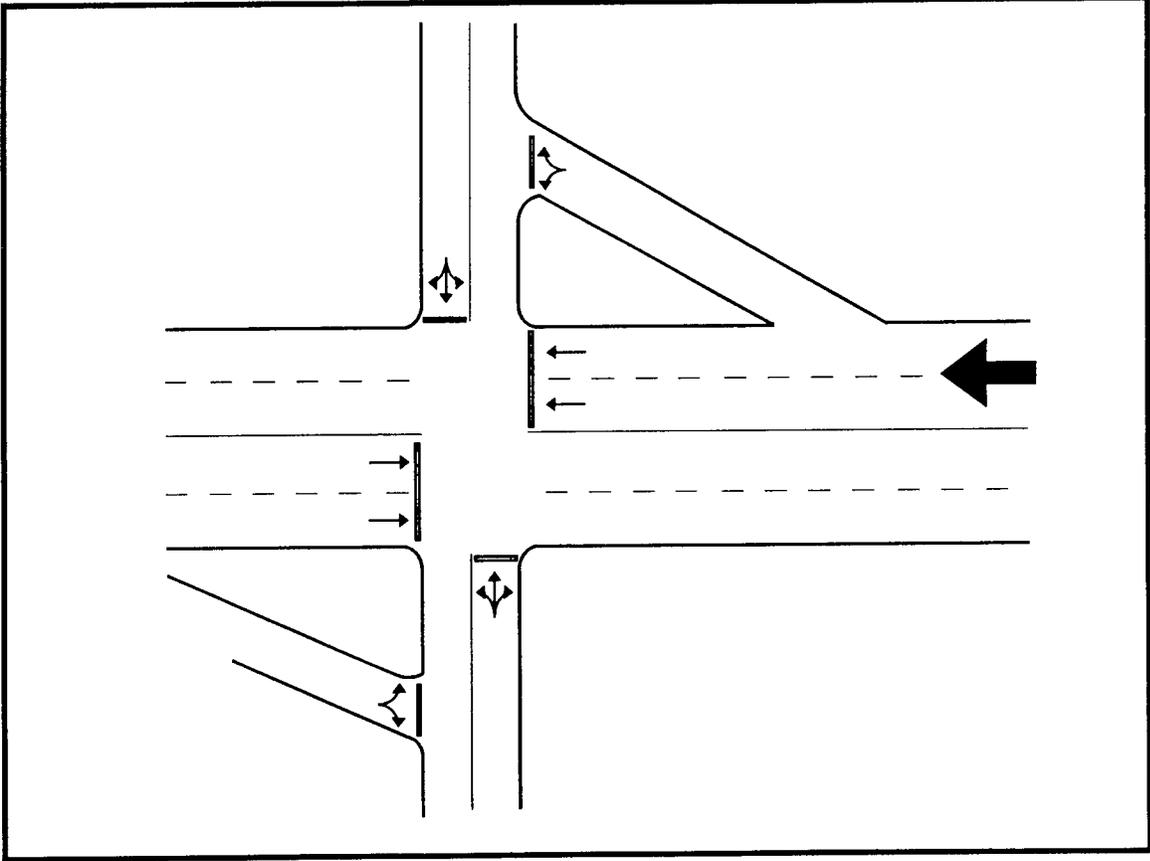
Intersection type 15: 4-lane roadway with jughandle-type ramp at 2-lane crossroad.
